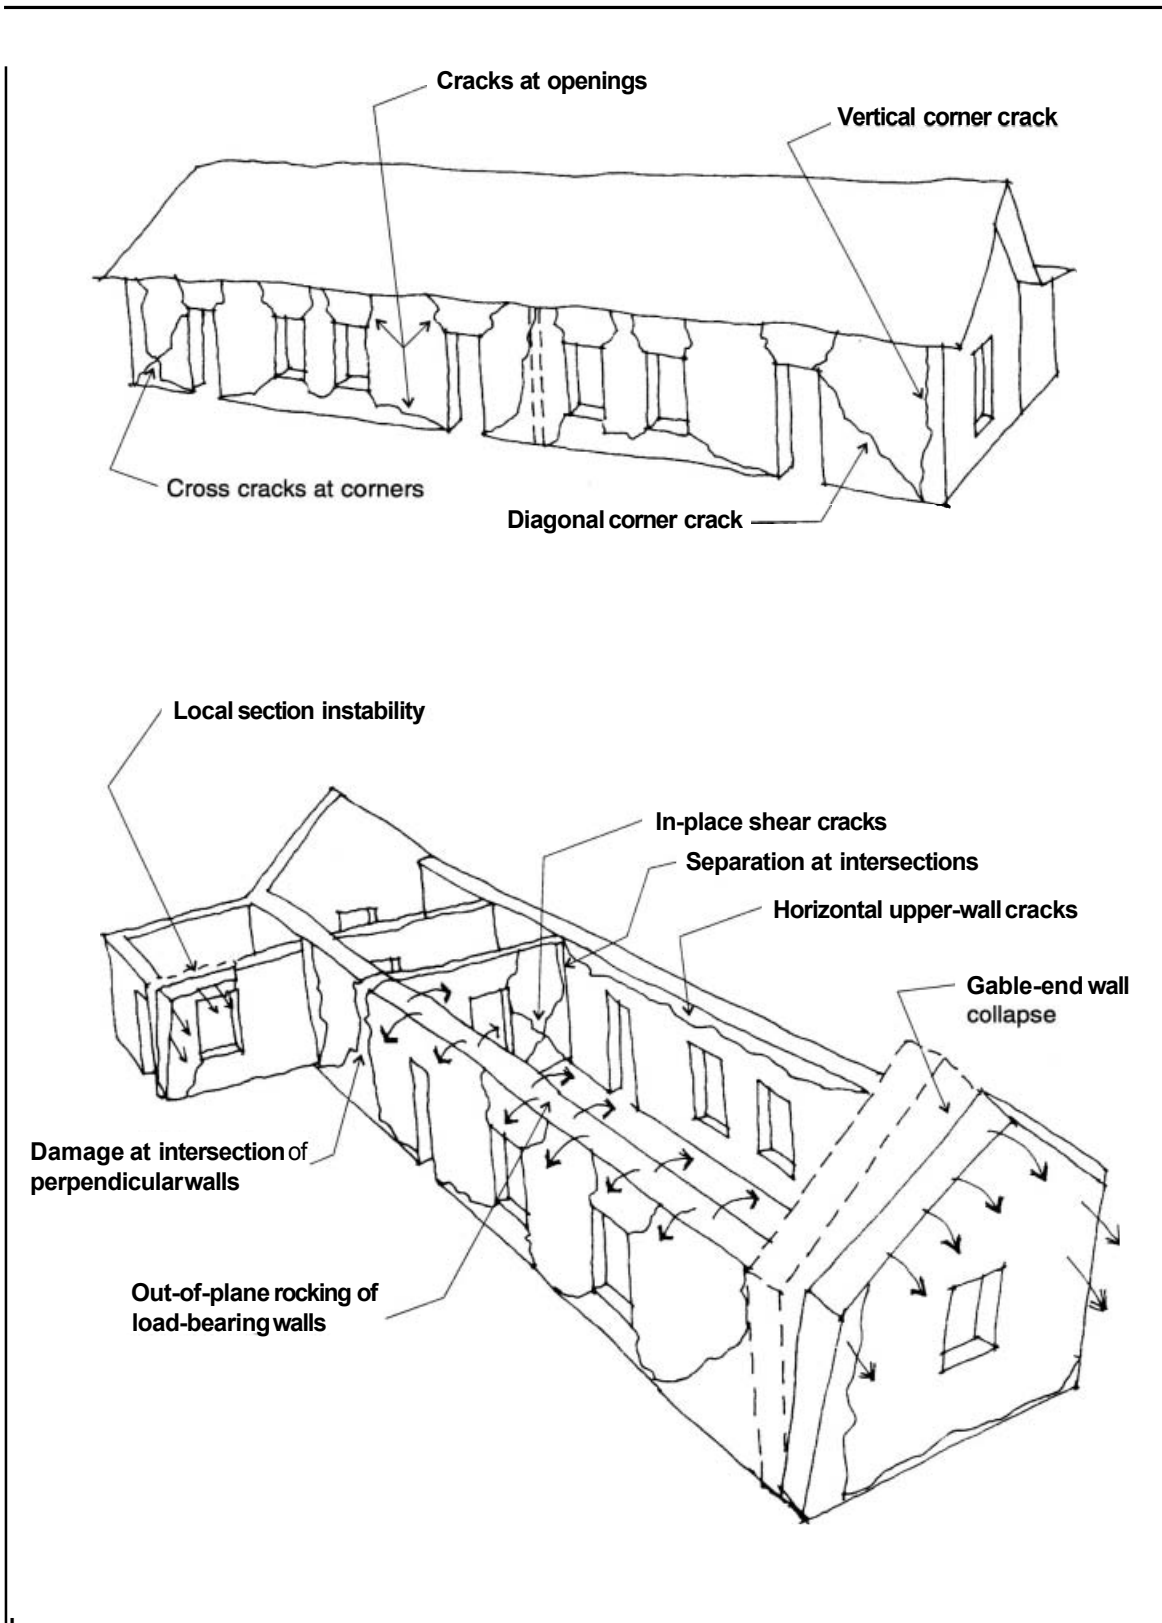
Typical failure typologies observed in historic adobe buildings after the Northridge earthquake.
